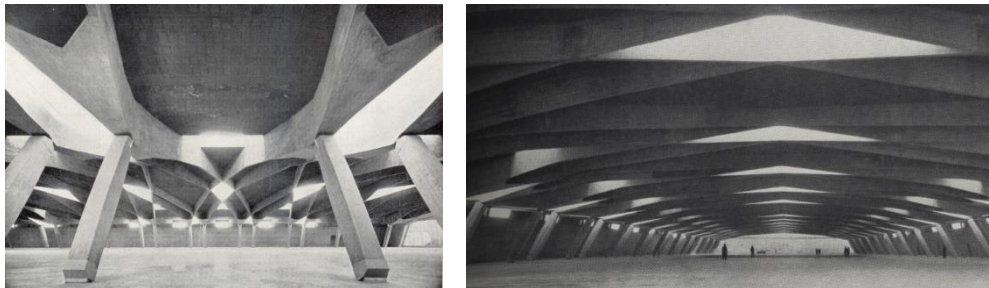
Turin Exhibition Center, underground Pavilion by Riccardo Morandi: general views
